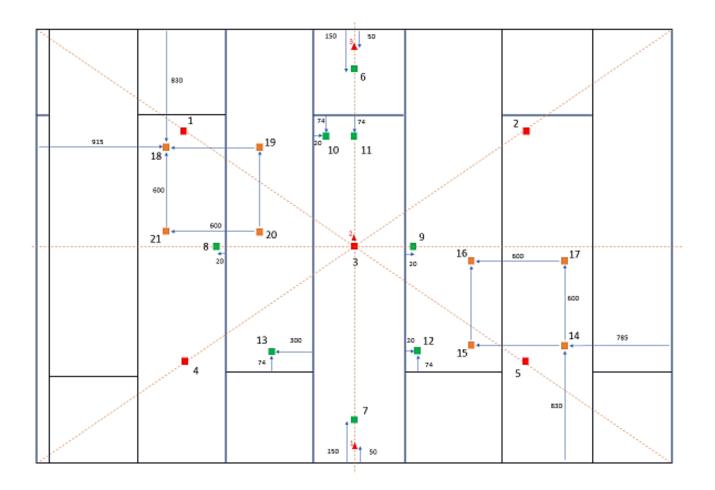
Layout of the instrumentation installed on the unexposed side, including the thermocouples installed over the electrical equipment.
